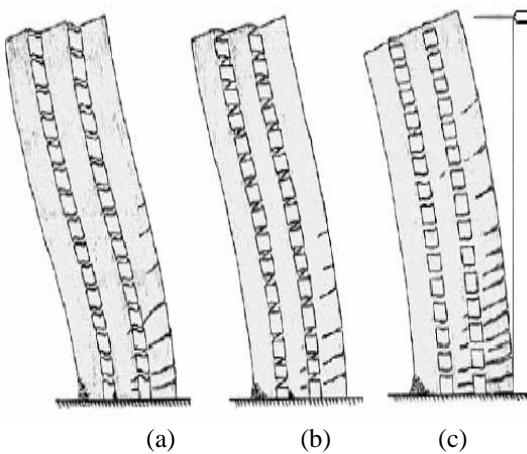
Modes of failure of shear walls. a) Mode of failure one, b) Mode of failure two &, c) Mode of failure three.
